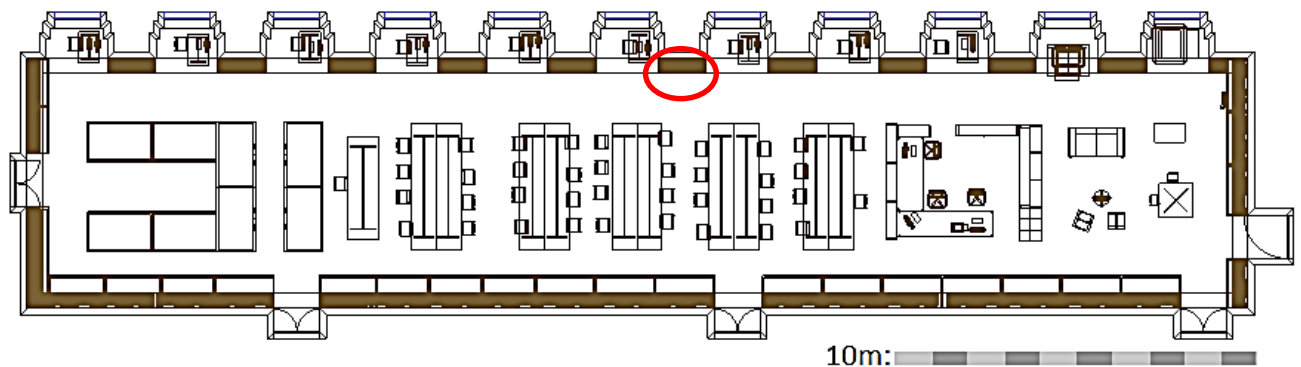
Academy of Fine Arts Reading Room – Floor plan
